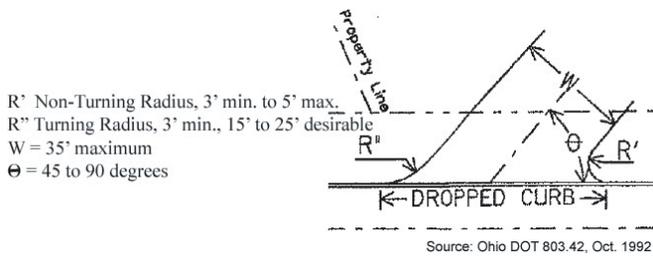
shows a guideline for angled, one-way driveways, from Ohio DOT design details. Exhibit 5-42 lists suggested minimum allowable intersection angles for driveways.
